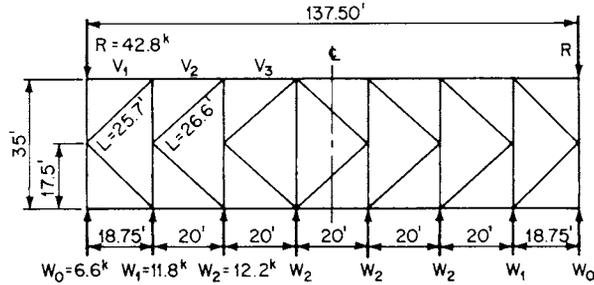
Lateral bracing system for deck-girder bridge.
